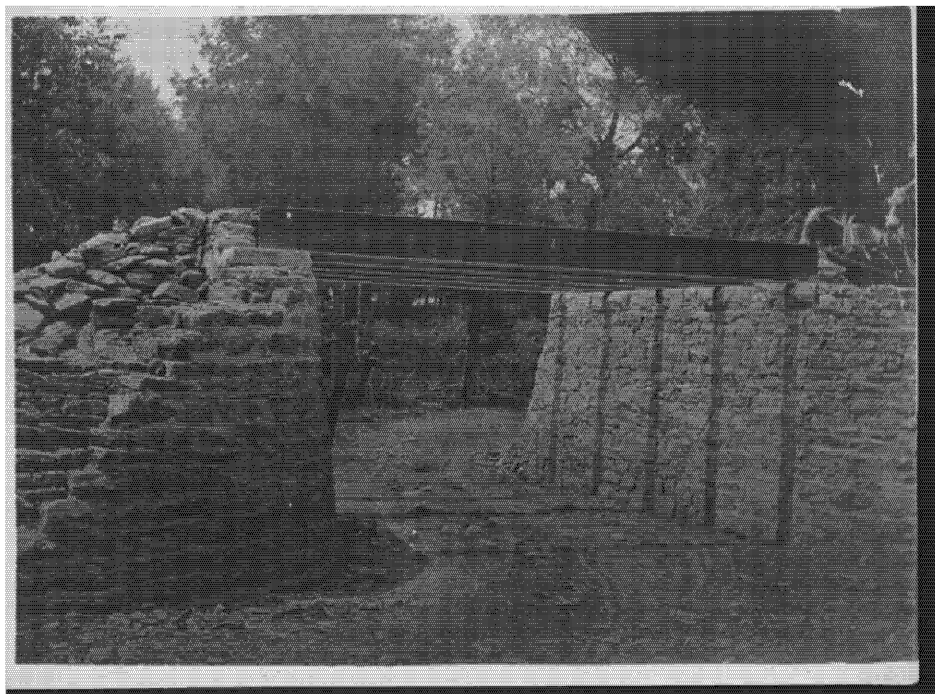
View of Gordon's Slough Bridge with girders in place, 1907.
